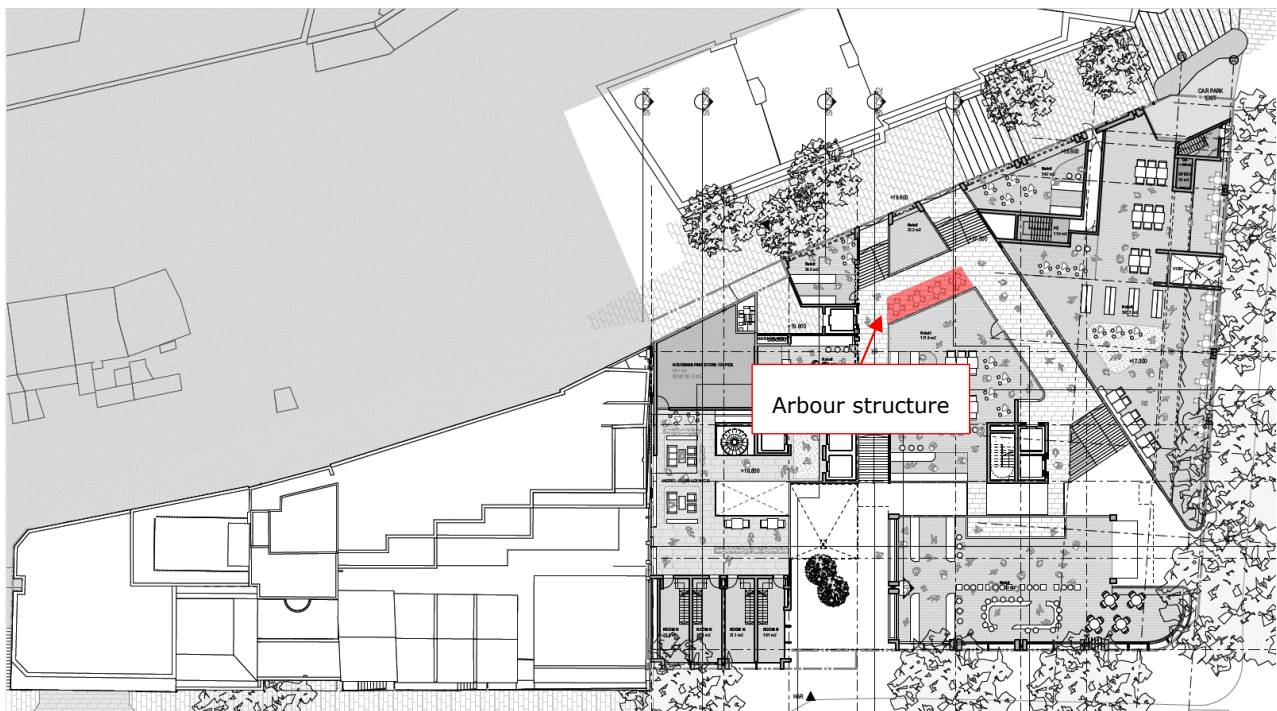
Recommendations for wind amelioration overlaid on Upper Ground level plan.
